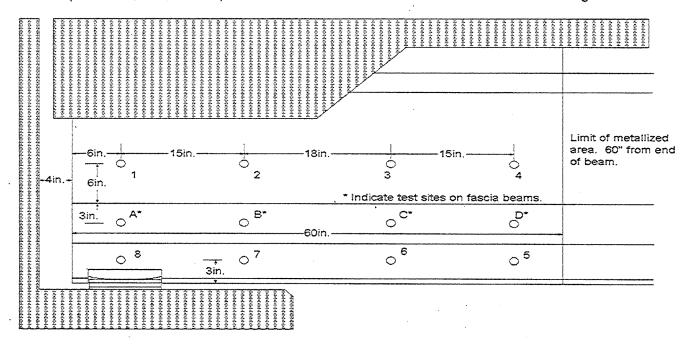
Metallized area on beams and corrosion potential test sites. Letter sites on fascia beams only.
